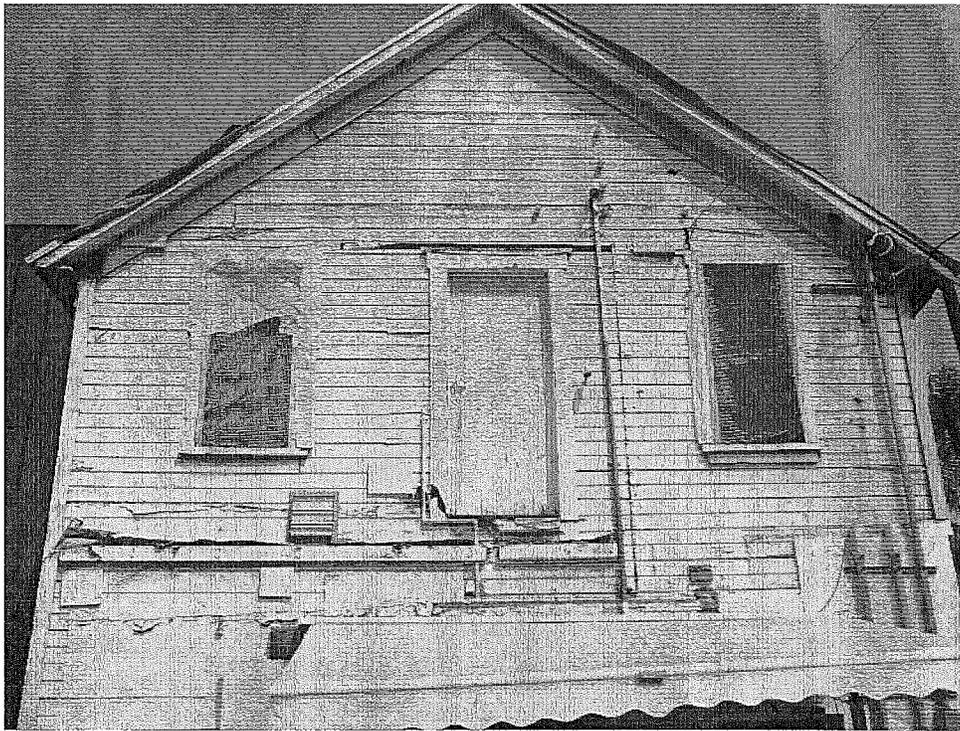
122 Main Street, Rear (south) elevation, view to northwest (PCR 2012)
